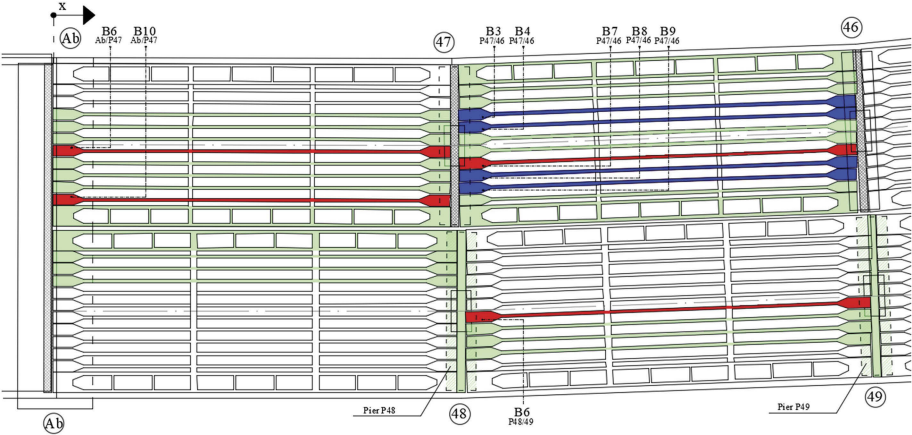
In-service layout of the investigated structural members (first group of tested girders in blue, second group of tested girders in red).
